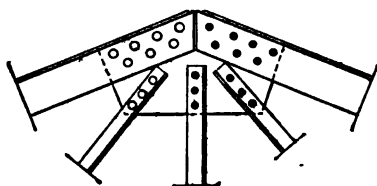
Detail of Joint G, Fink Truss, Fig. 7
